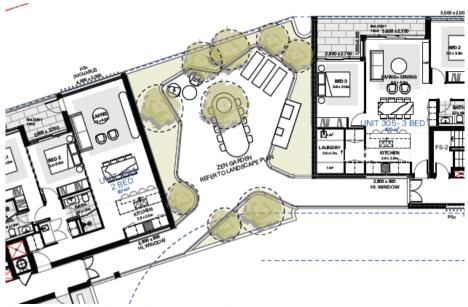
Revised Level 3 Communal Open Space Access Source: PBD Architects
